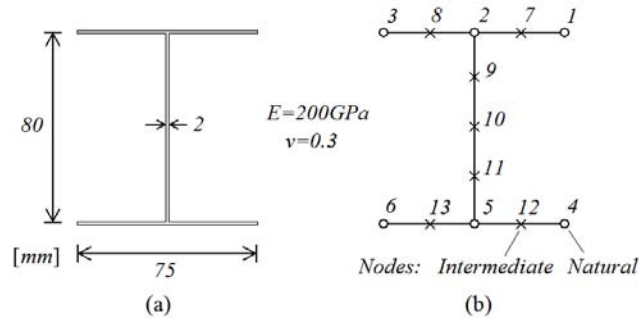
Cantilever I-section (a) geometry and dimensions and elastic constants, and (b) GBT nodal discretization
